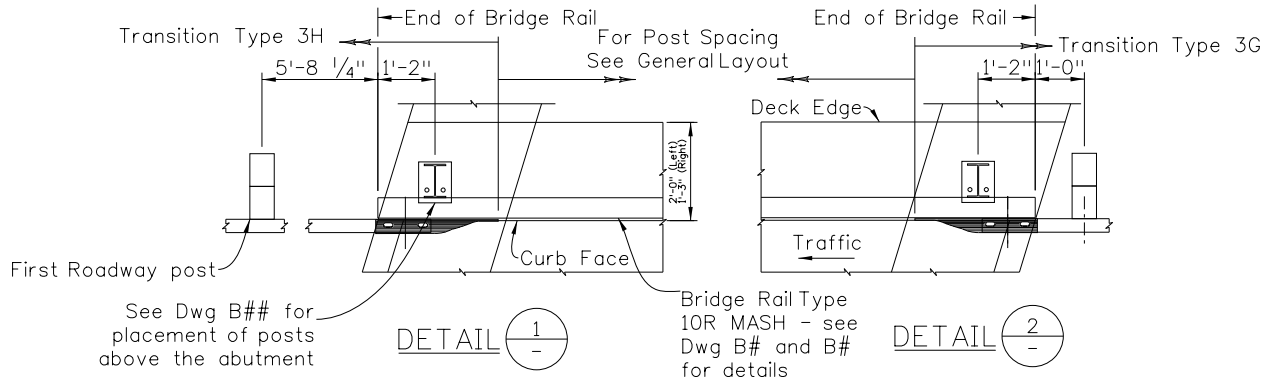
(A)-1 Sample Plan showing Bridgerail Post Spacing
